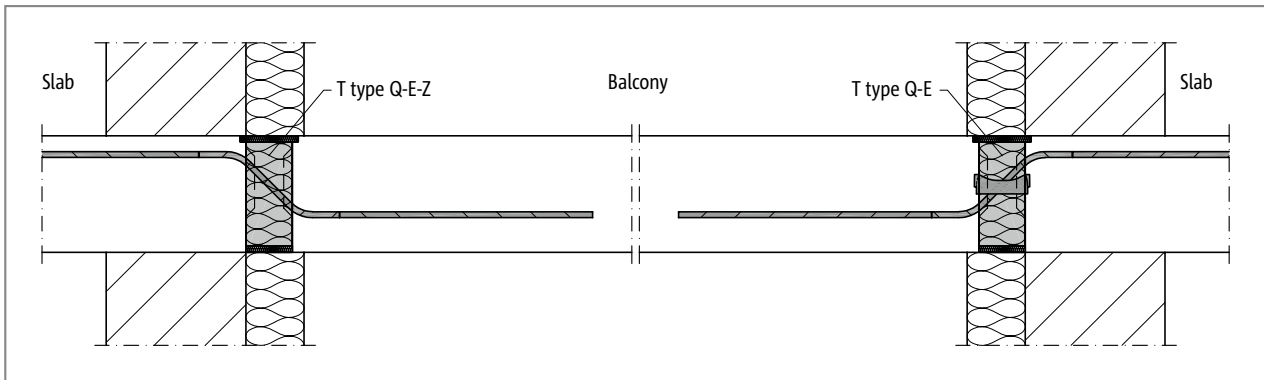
Schöck Isokorb® T type Q-E-Z, Q-E: Application case one-way reinforced concrete slab
